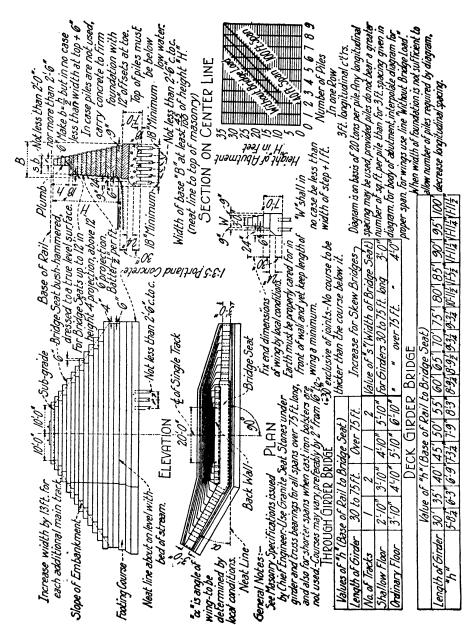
Masonry Abutments, Baltimore and Ohio Railway.
